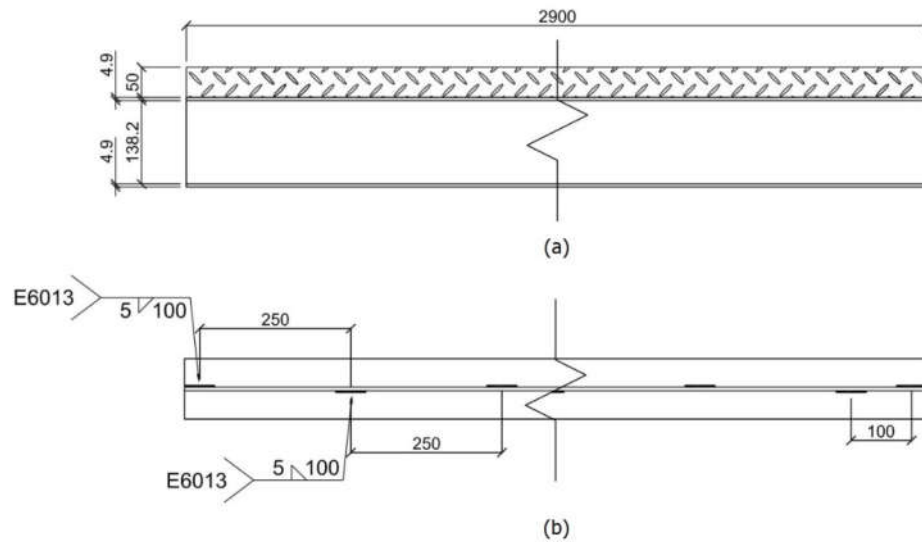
Connection between steel profile and steel plate connector; (a) lateral view. (b) Top view. Dimensions in mm
